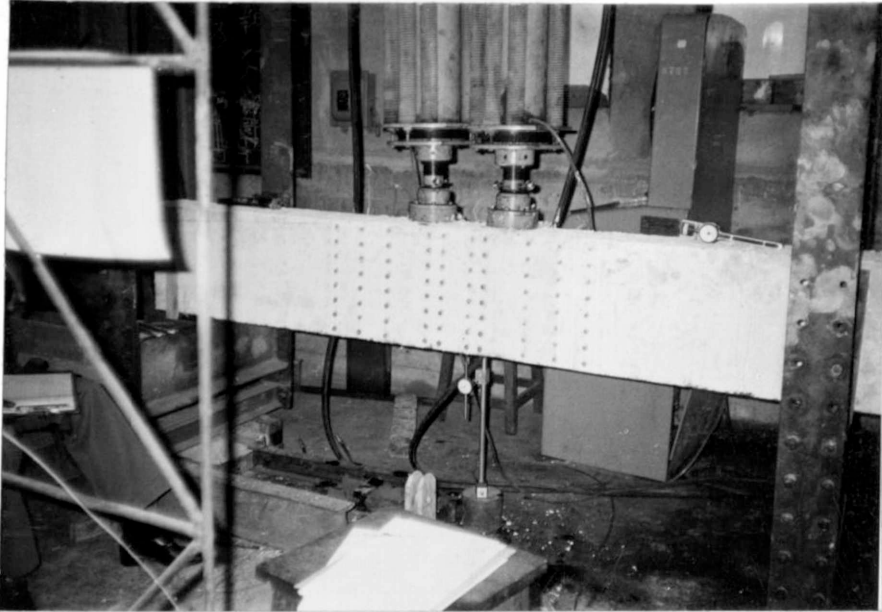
Beam CFT-TB1 in Test Rig (front side)
